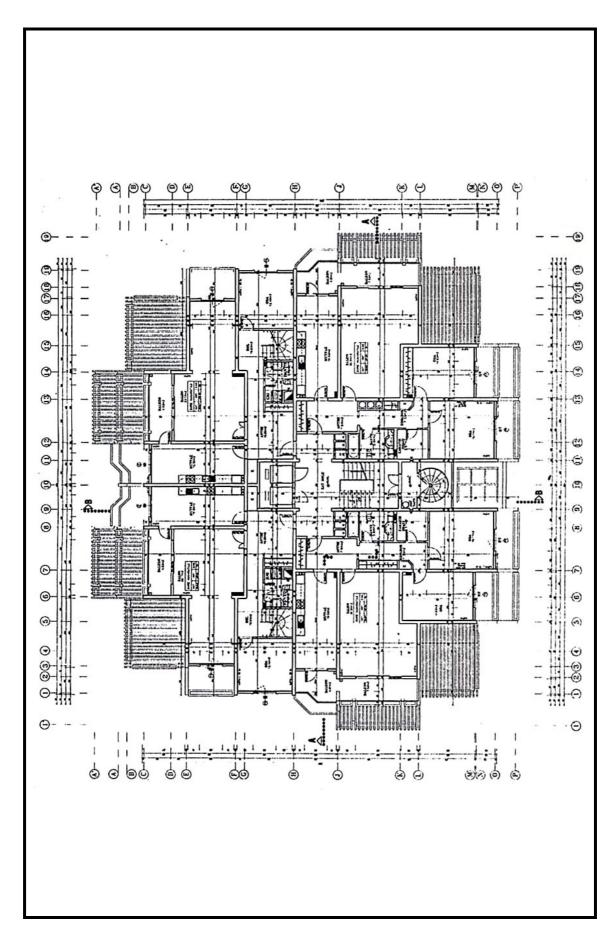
Mavişehir II; Flamingo 20th-Floor Plan
